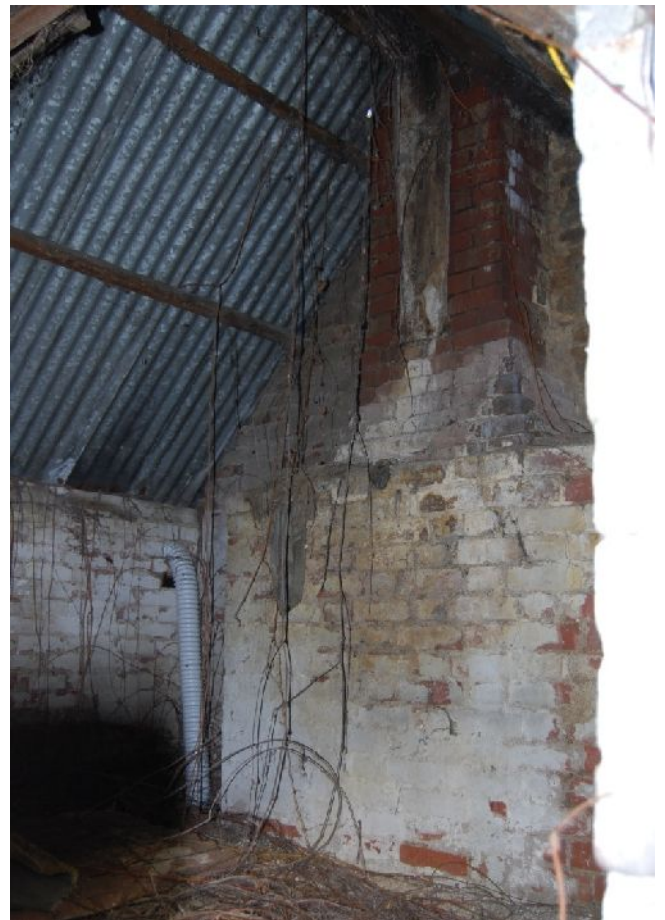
Building 2, 1st floor flue (from SSW; no scale)
